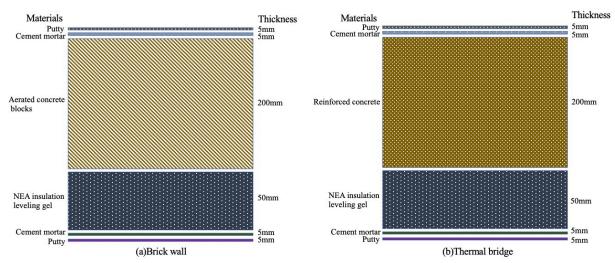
Diagram of external wall construction elements regarding the studied educational building
